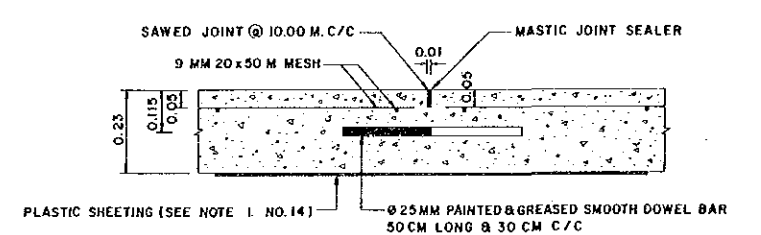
DETAILS OF CONSTRUCTION JOINT S = 1 / 10
